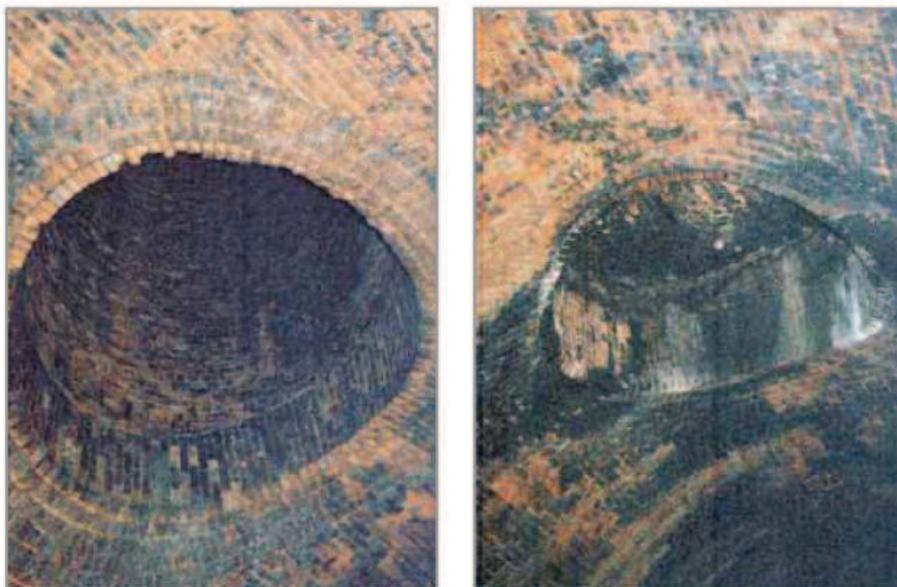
Examples of open and closed shafts in a brick-lined tunnel [1]
